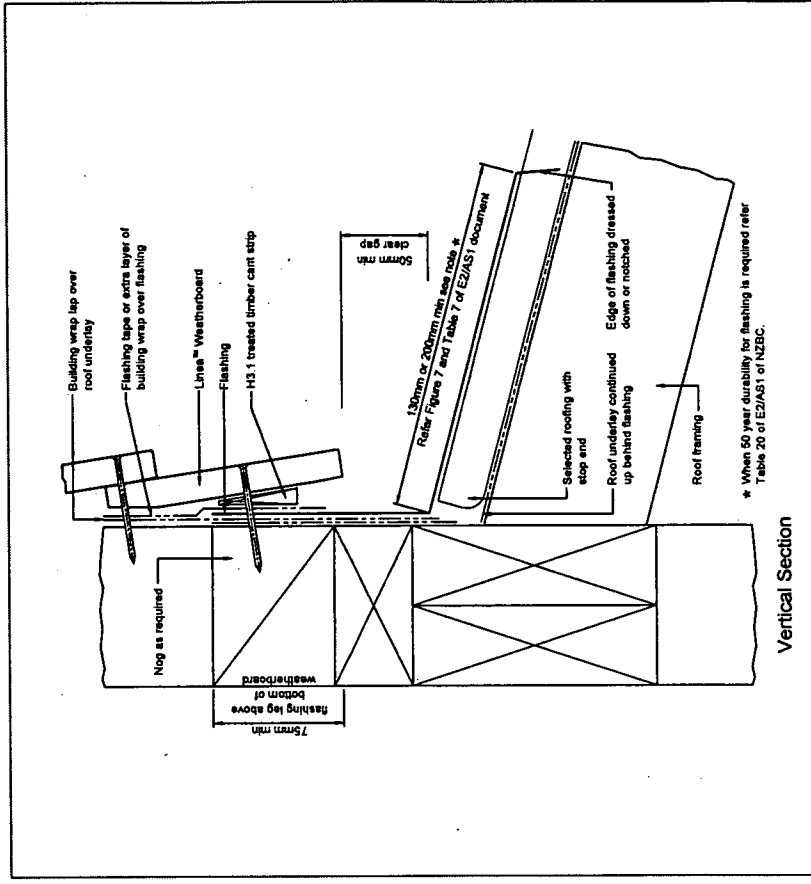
DIRECT FIX ONE PIECE APRON FLASHING JOINT
